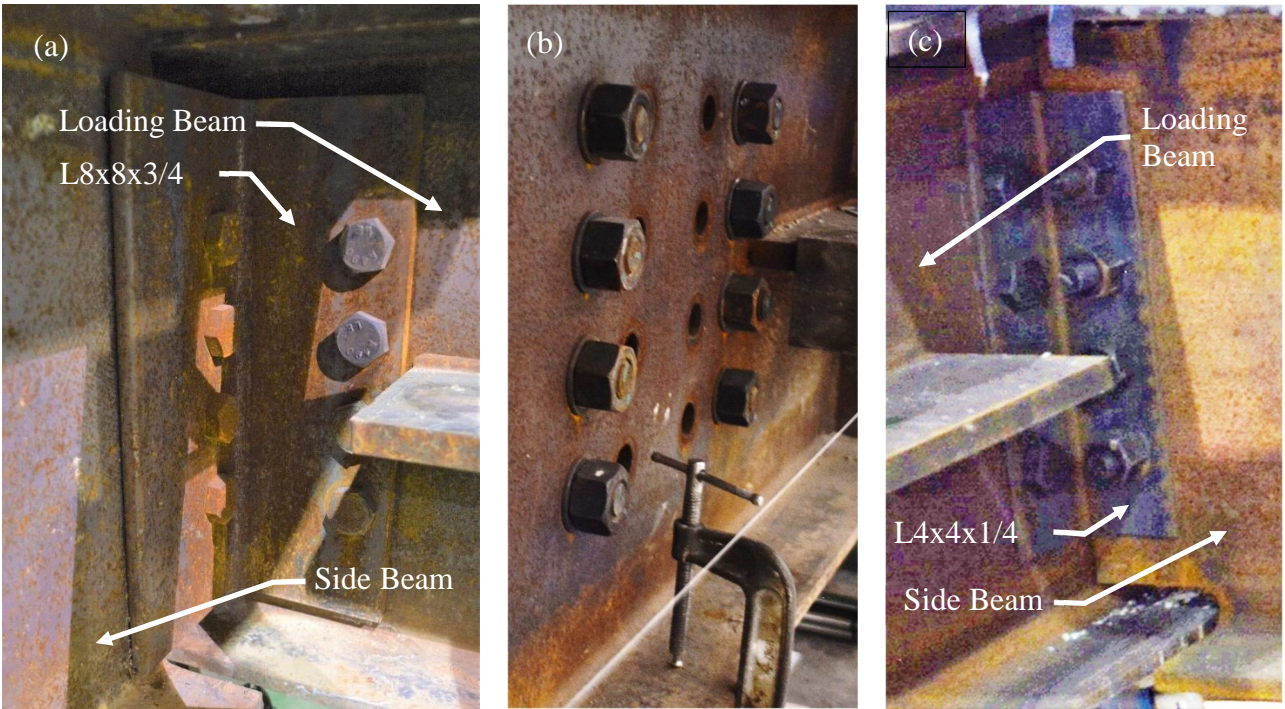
Connection between Loading Beam and Side Beams: (a) Angles (8x8x3/4) Used in Reinforced Specimens and Specimens Failing Perimeter Fasteners, (b) Eight Bolts Connecting Loading Beam to Side Beam, (c) Angles (4x4x1/4) Used in Unreinforced Specimens with DT Failure
